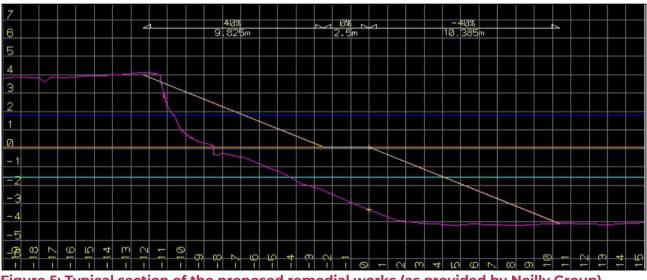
Typical section of the proposed remedial works (as provided by Neilly Group) Notes on Figure 5:
